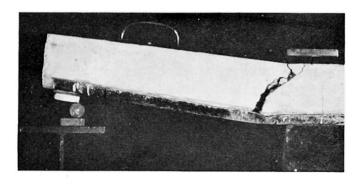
Typical shear-bond failure with end-slip of beam constructed with steel deck G
